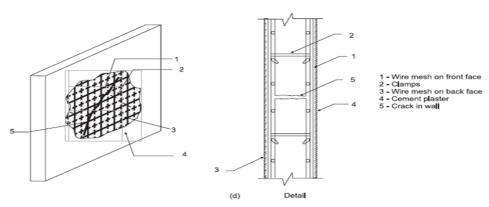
Strengthening of existing width crack masonry [5]
